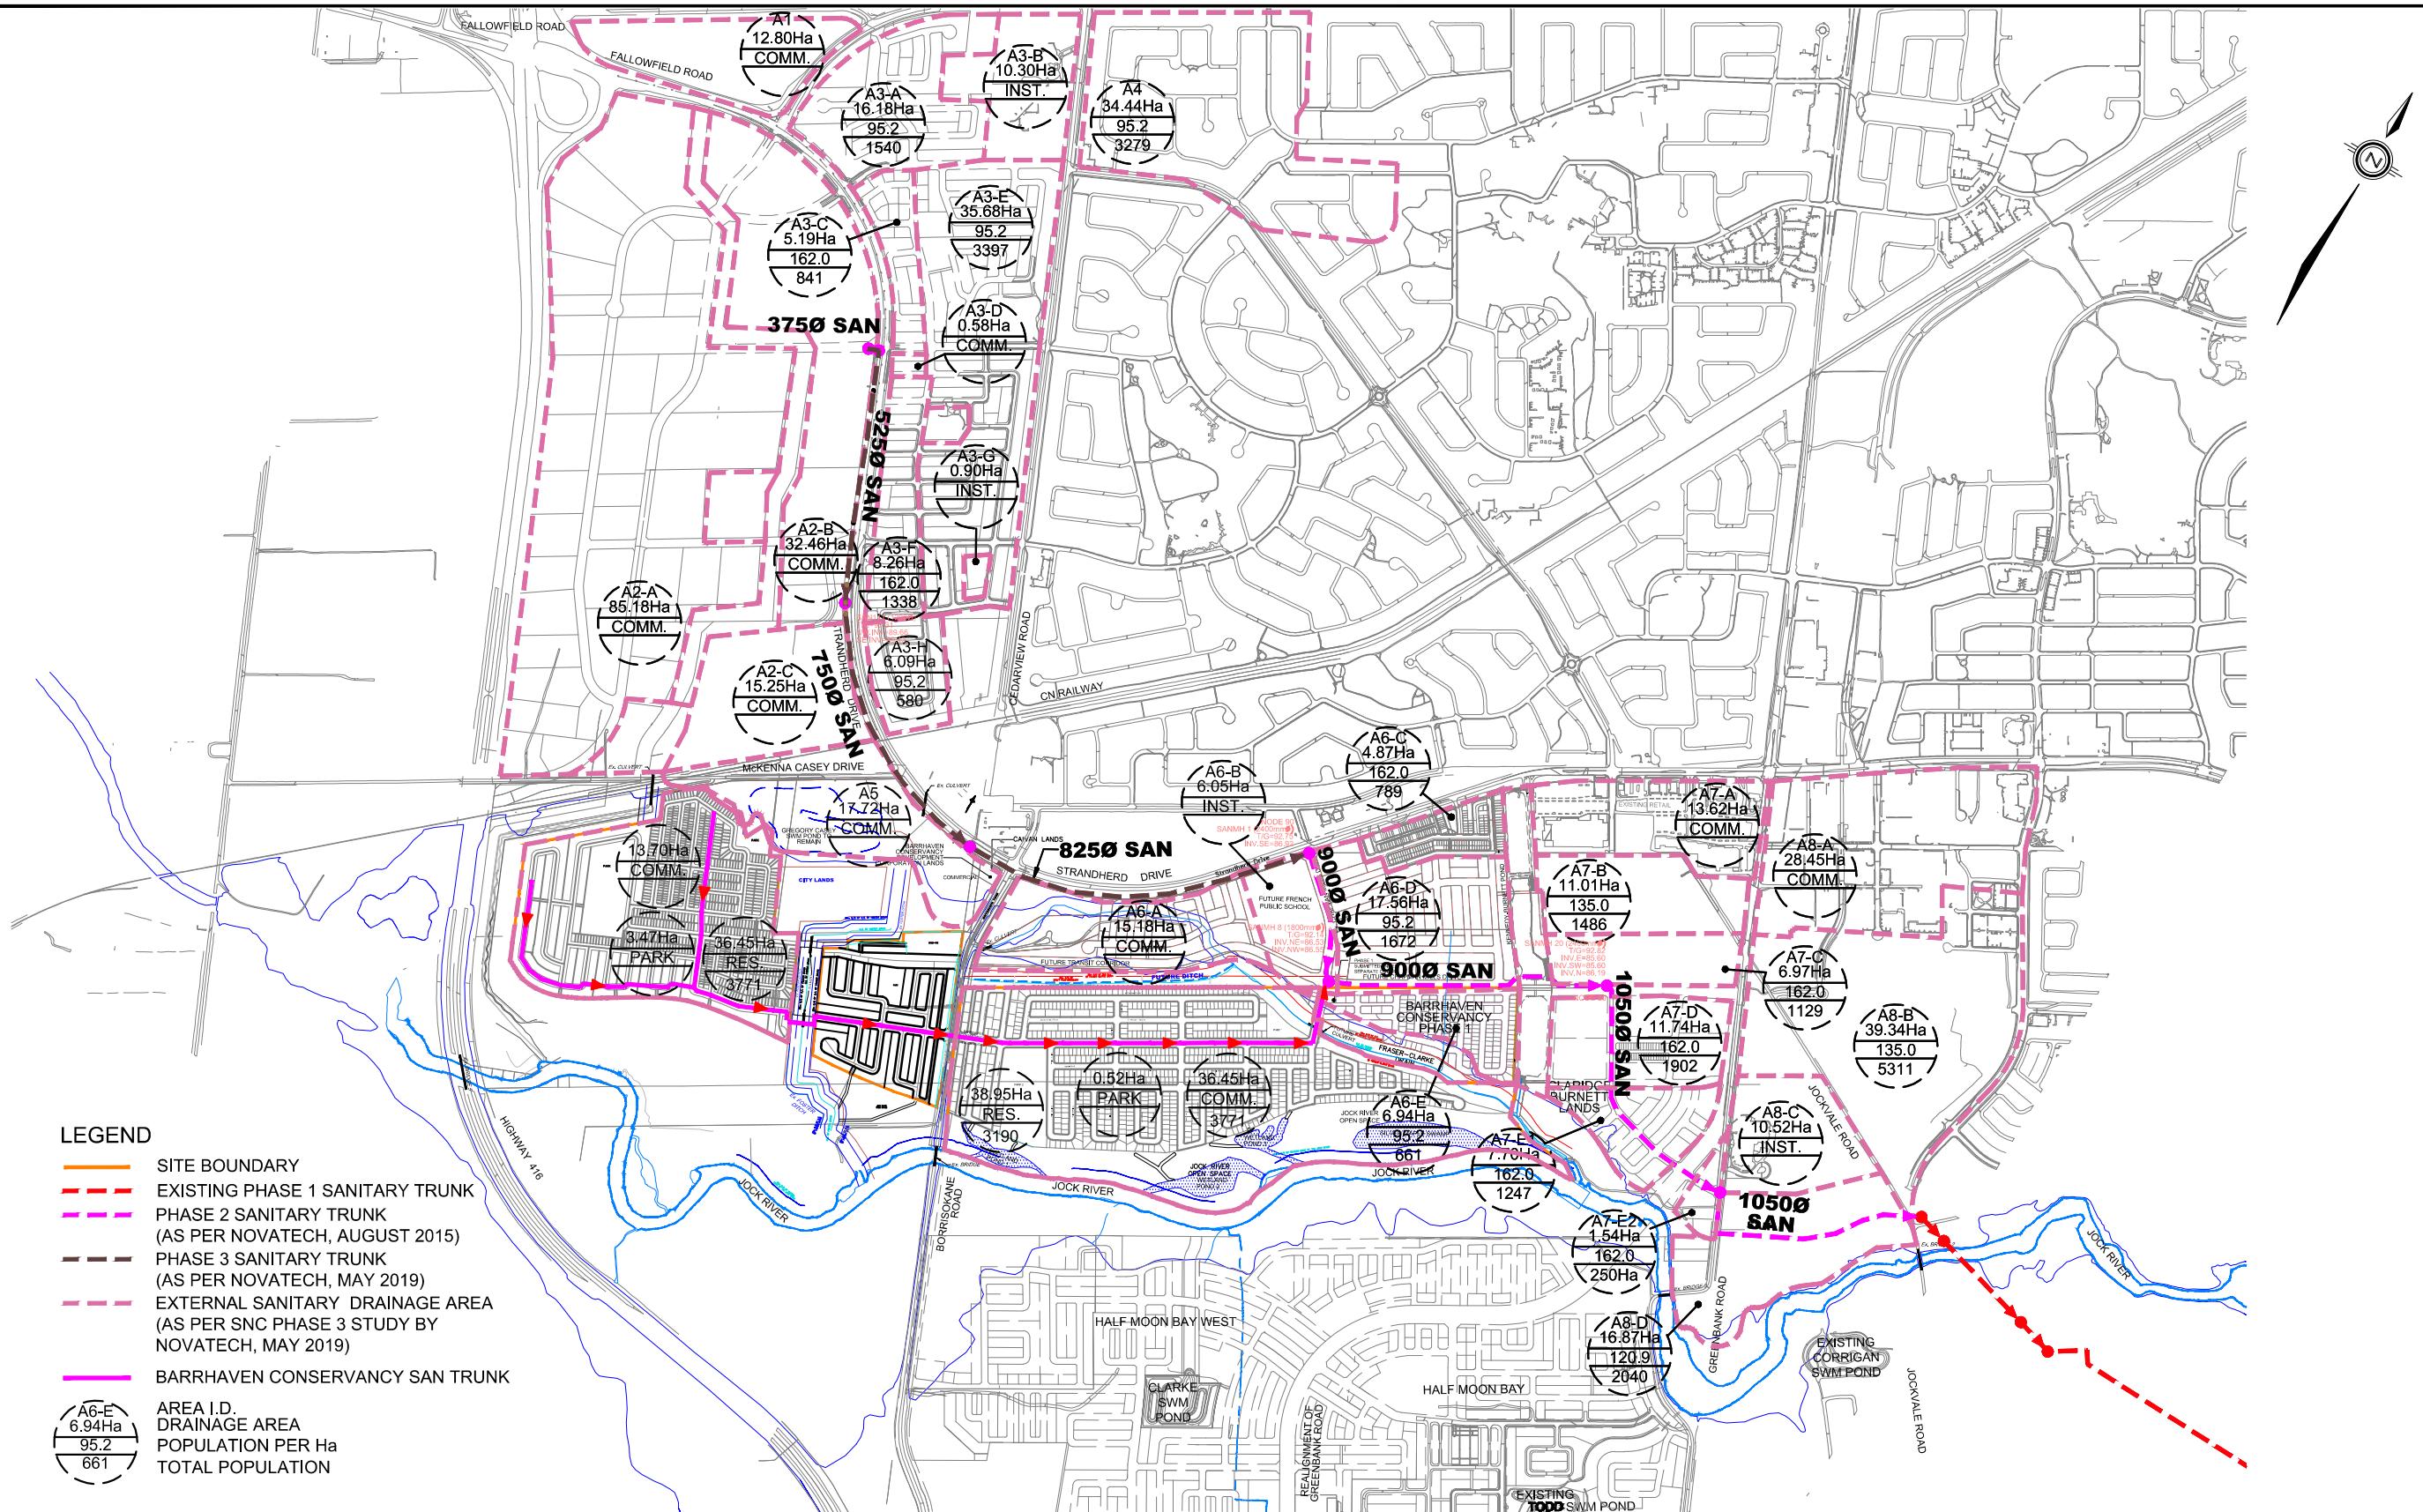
B 2022 PROPOSED REVISED DRAFT PLAN
